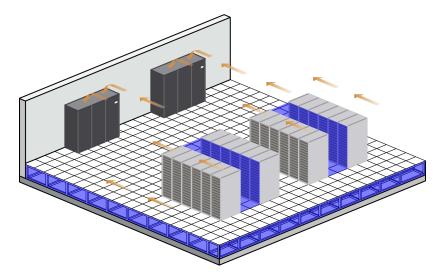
Perimeter air conditioning with Hot Aisle–Cold Aisle layout [7]
